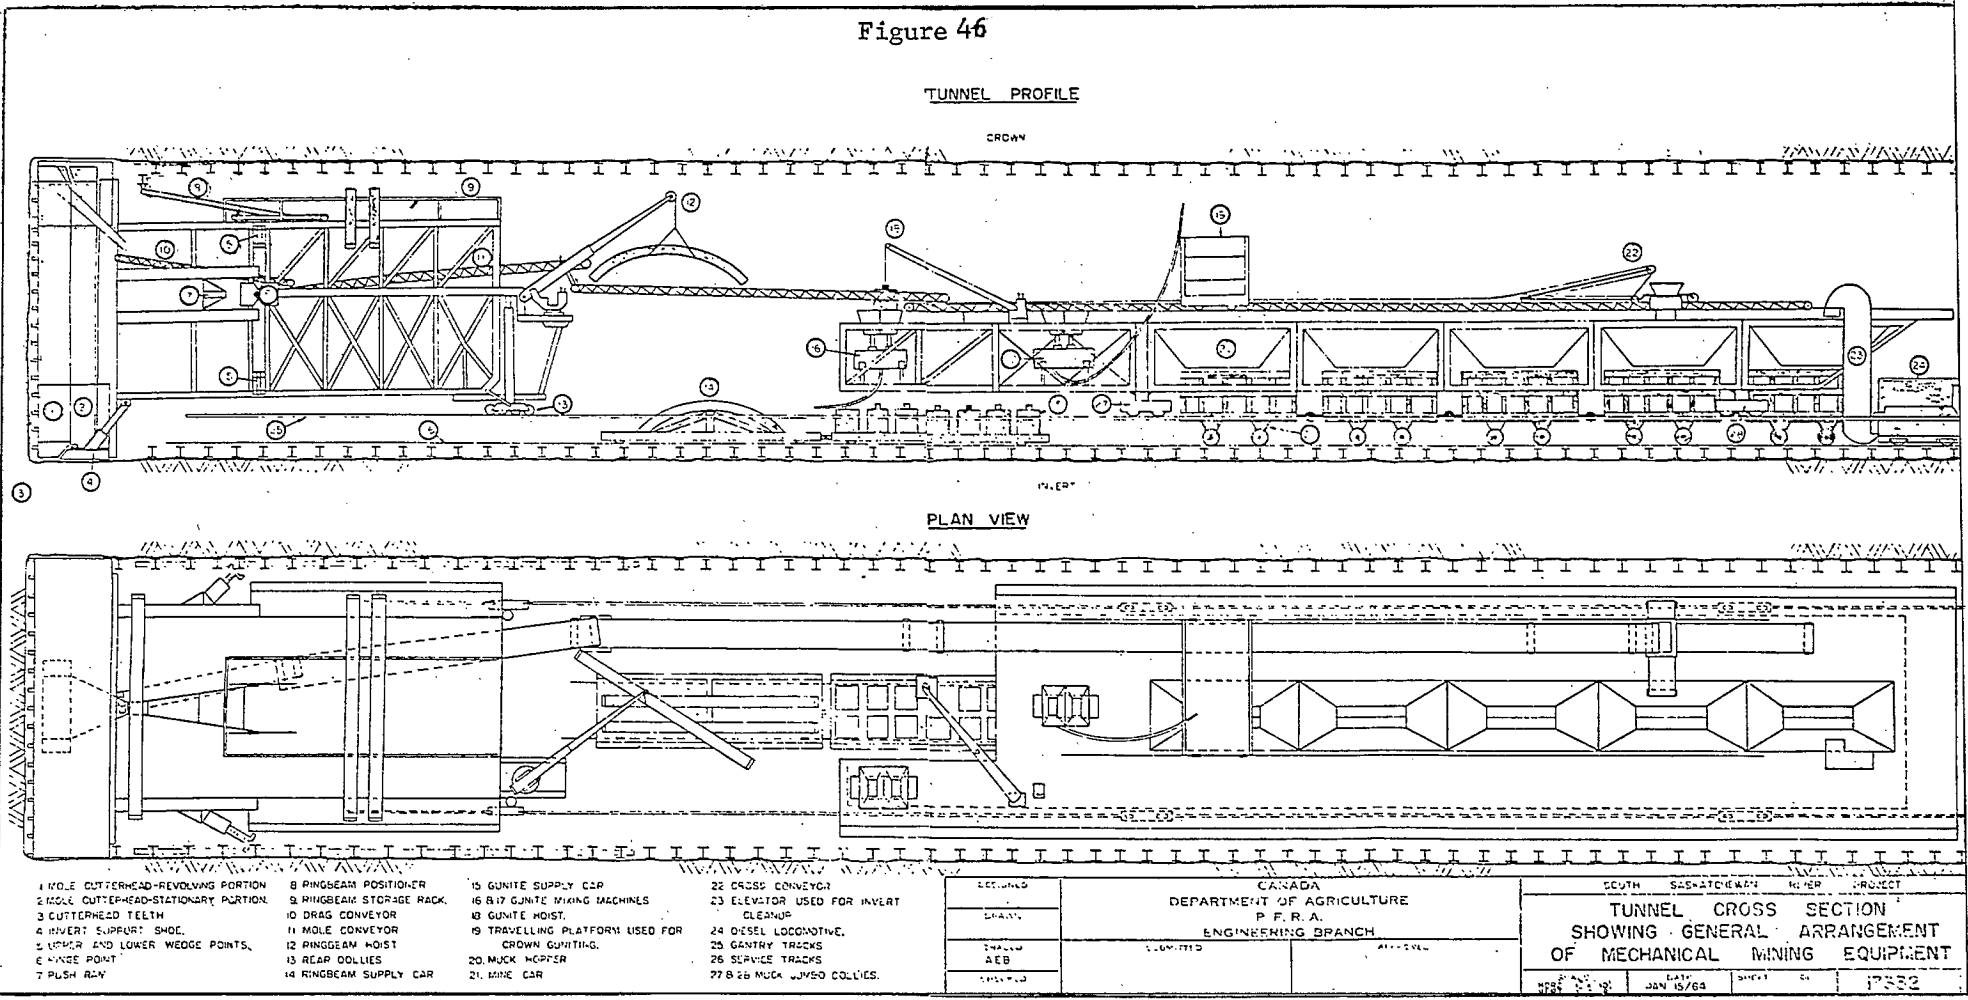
A plan and section view of the Robbins Model 261 boring machine.
